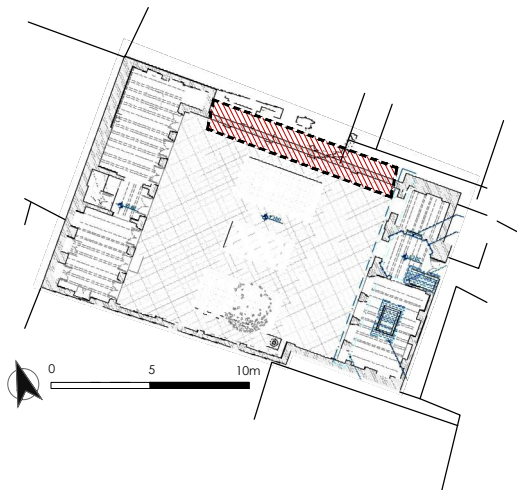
Use of wooden props and beams to prevent the collapse of the northeastern boundary wall.
